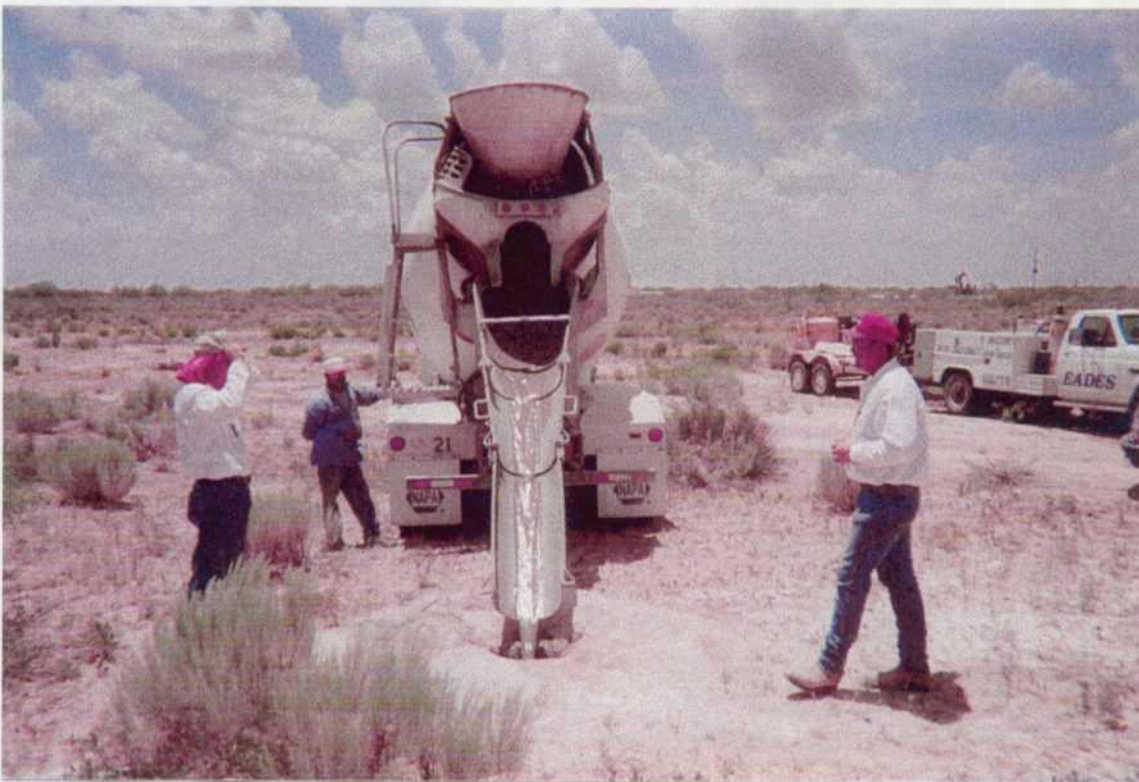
6/26/01. Looking southwest. Soil boring SB-1 plugged and abandoned.
